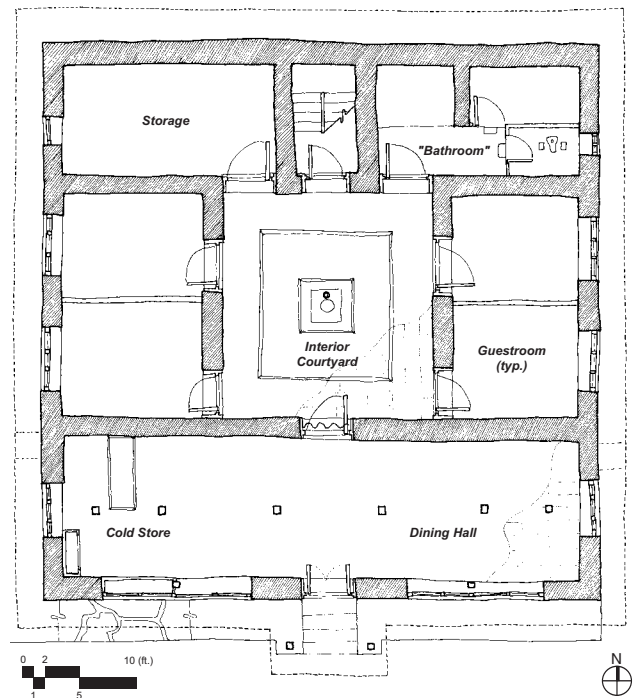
Yak Ryu Mount View Resort: first-floor plan.
